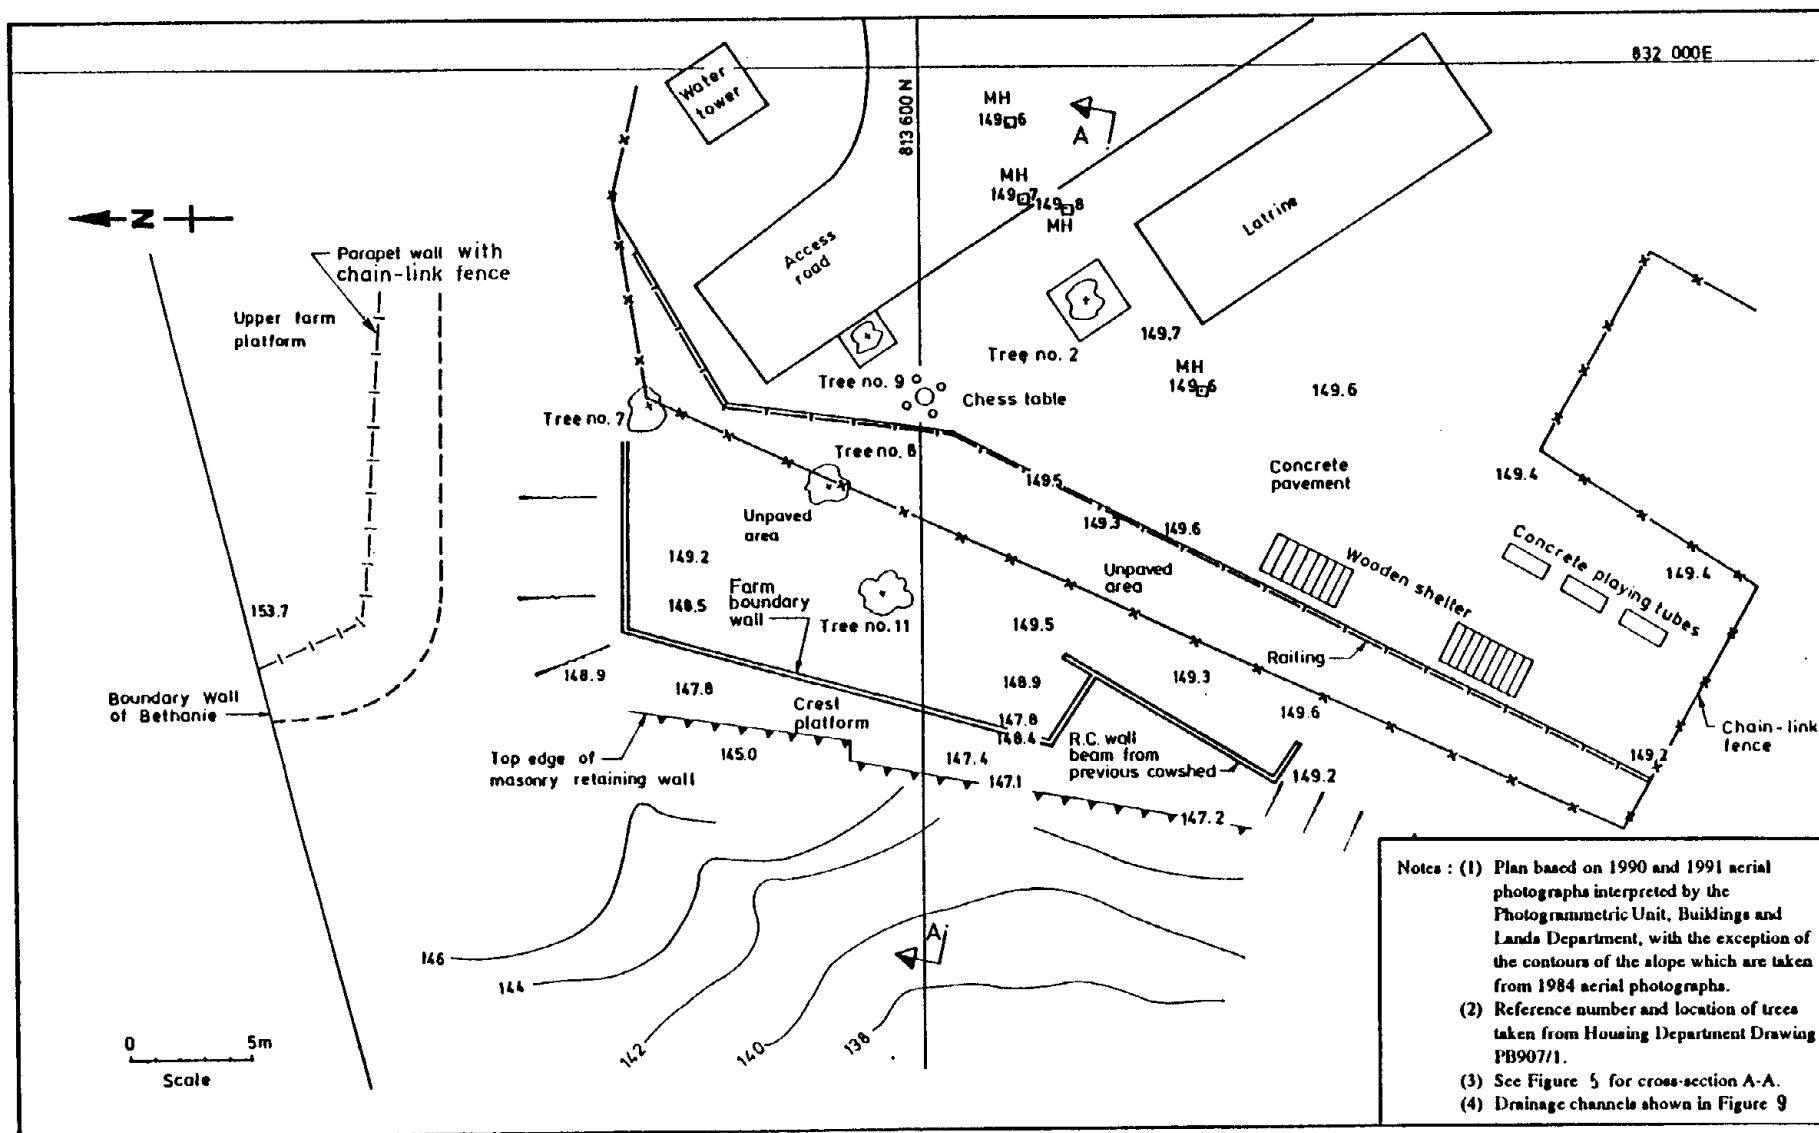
Site Plan of the Pokfulam THA Sitting-out Area Before the Landslide
